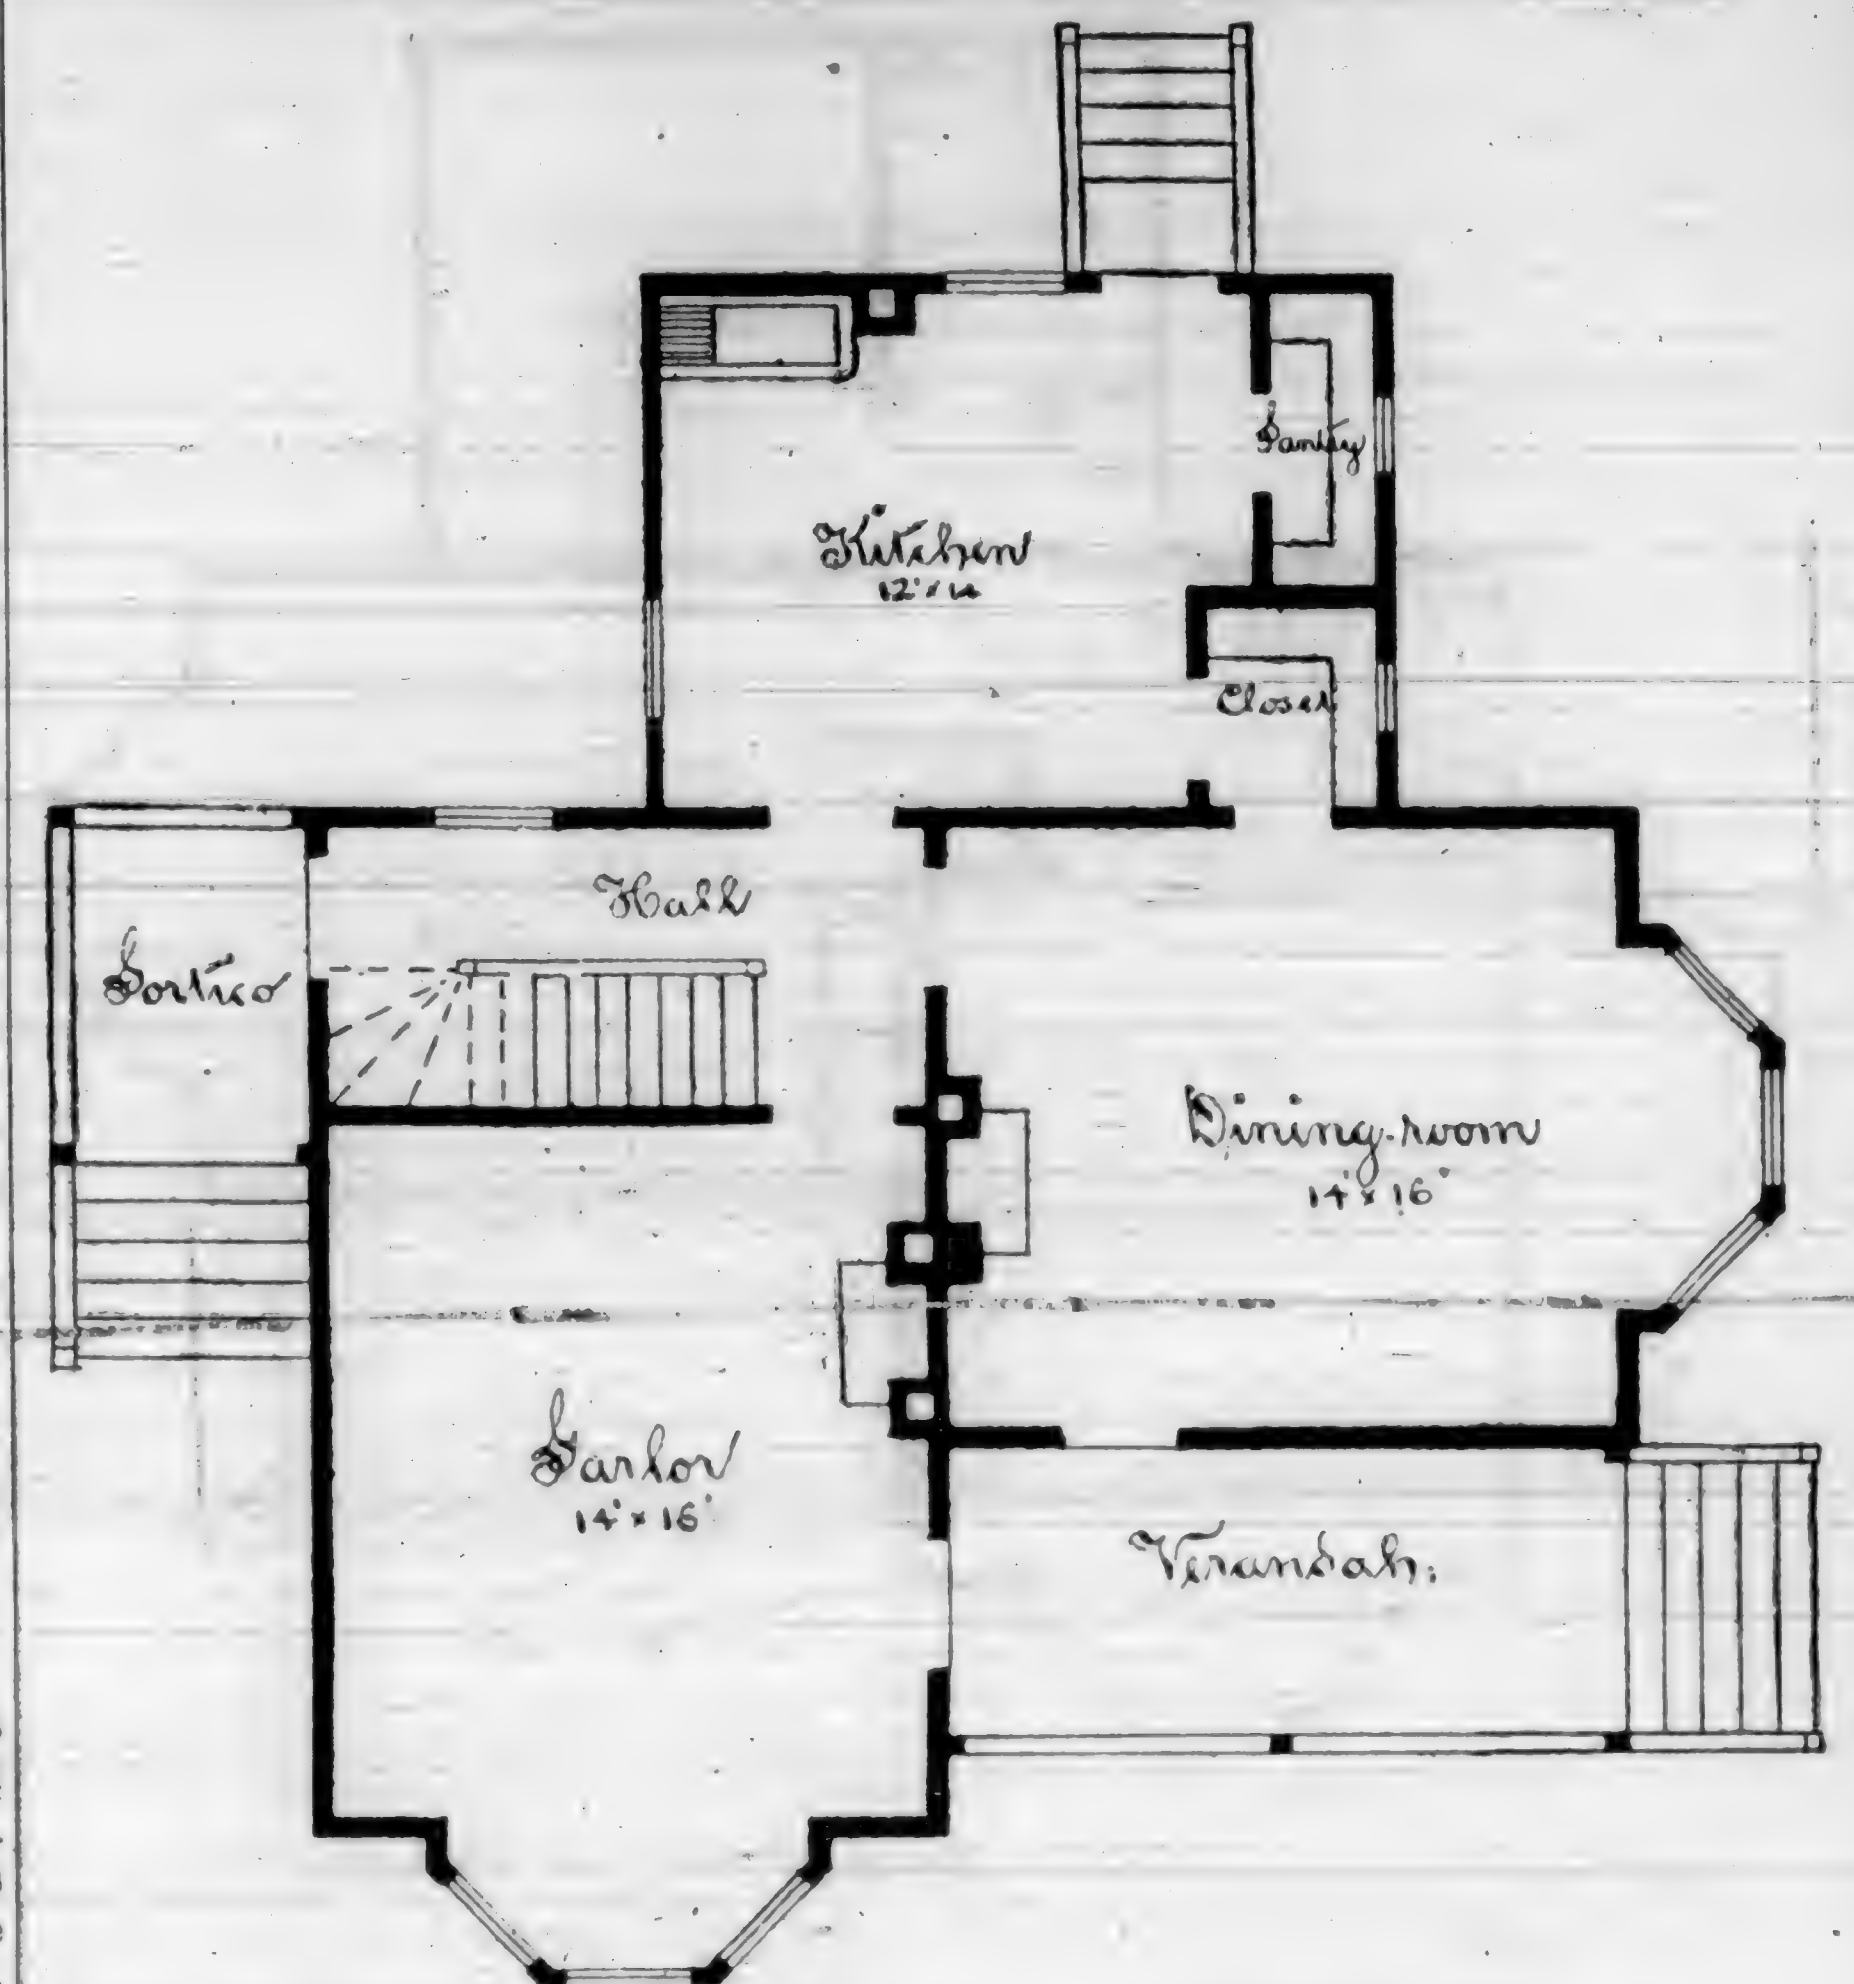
PLAN OF FIRST FLOOR, SUBURBAN DWELLING COSTING ABOUT \$3,000.
